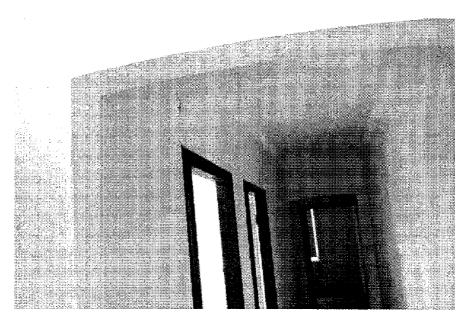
Green paint with elevated levels of lead located on the walls of residential tenancy 89D Liverpool Road.
